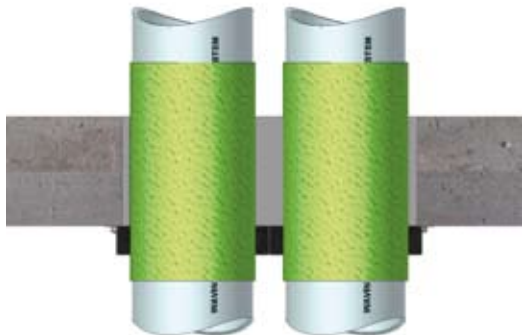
BM-90 fire collar: seal without sleeve for wall installation
